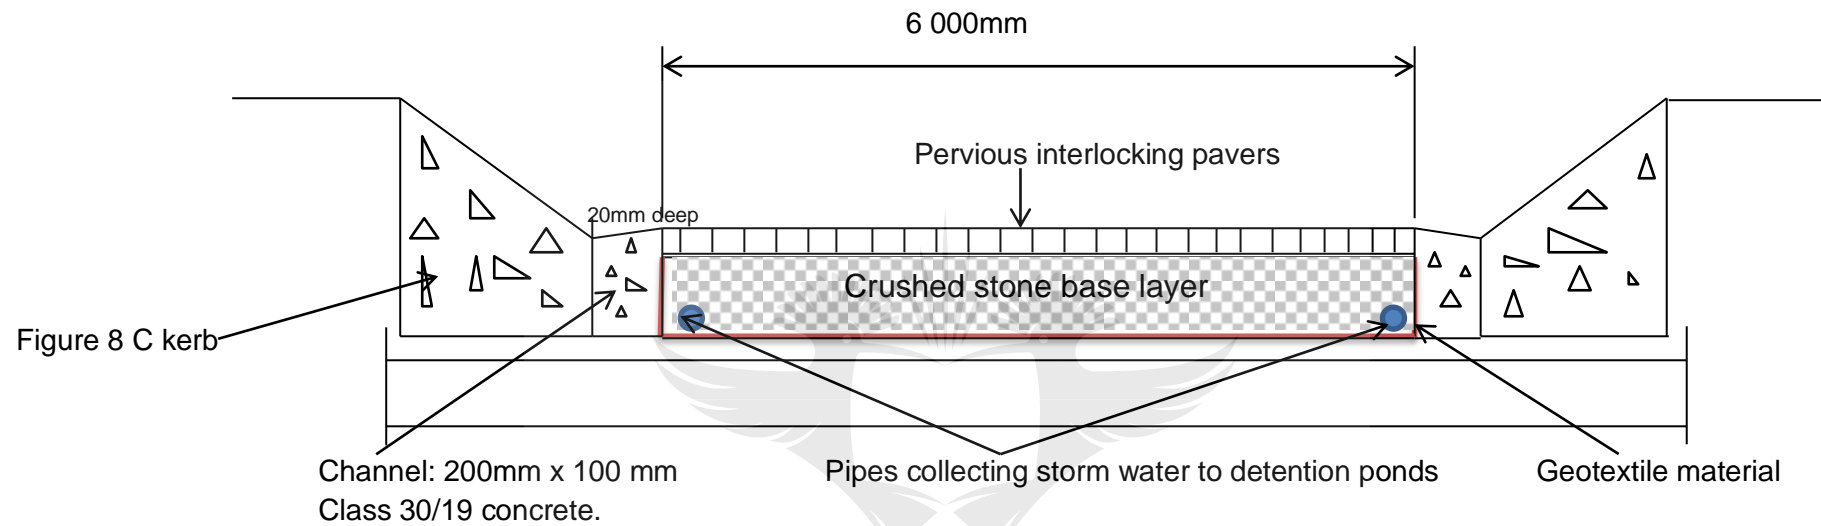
Typical cross section of pervious interlocking paving blocks pavement
